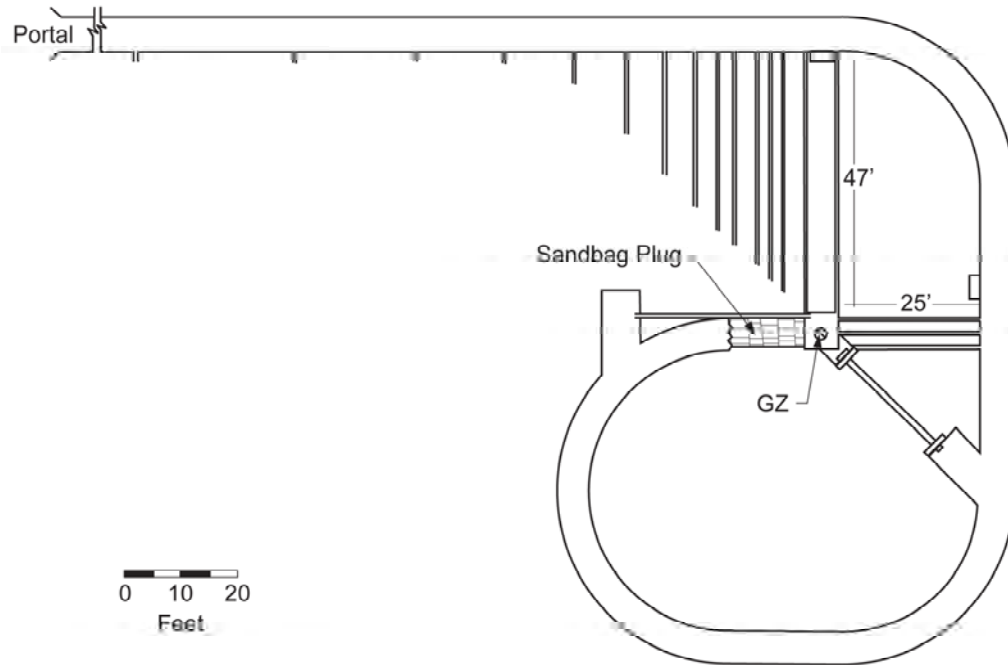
Rainier tunnel zero room emplacement with turns.
